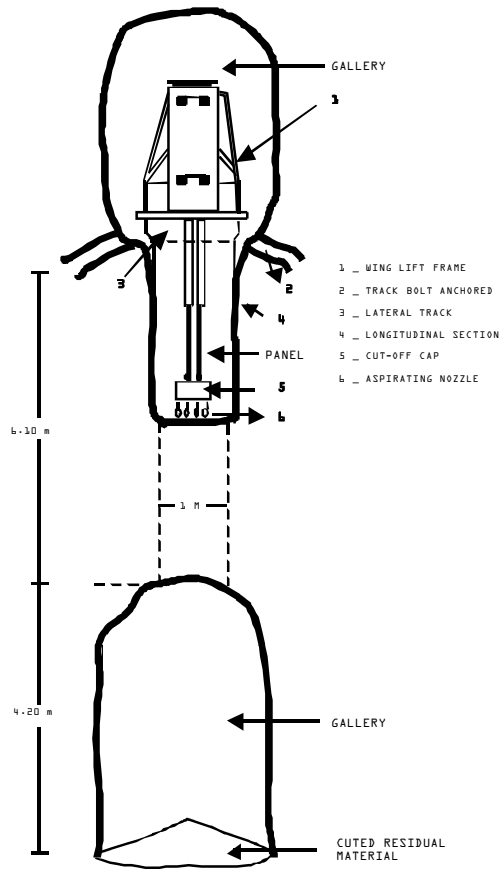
La Honda dam: High pressure water jet cut-off procedure (cross section)
